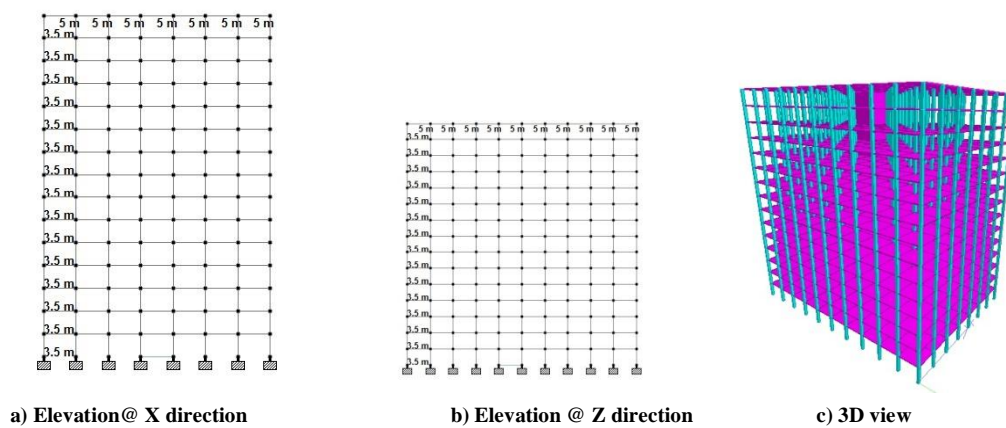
Model 1- G+14 Storey Building with Flat slab system having C-type shear wall.
